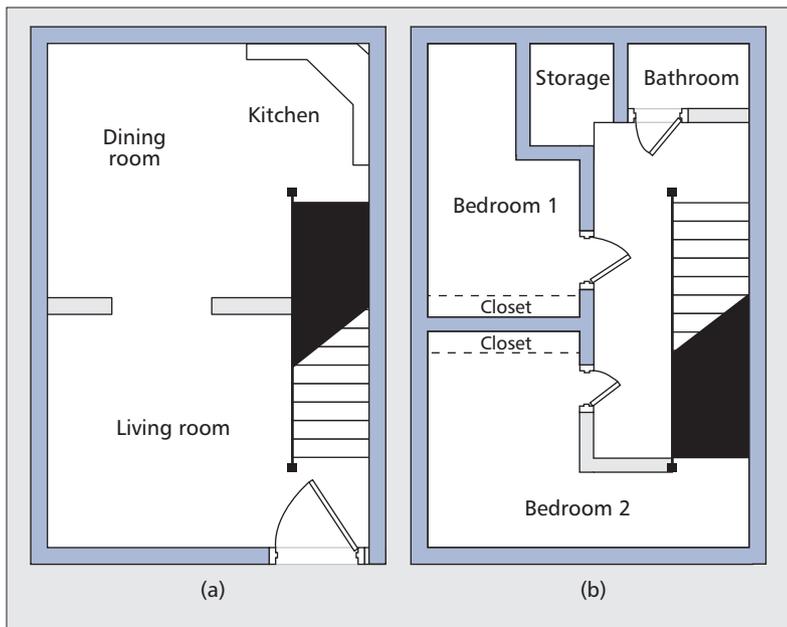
Floor plan of a typical townhouse in North American suburban residential areas: a) first floor; b) second floor.
